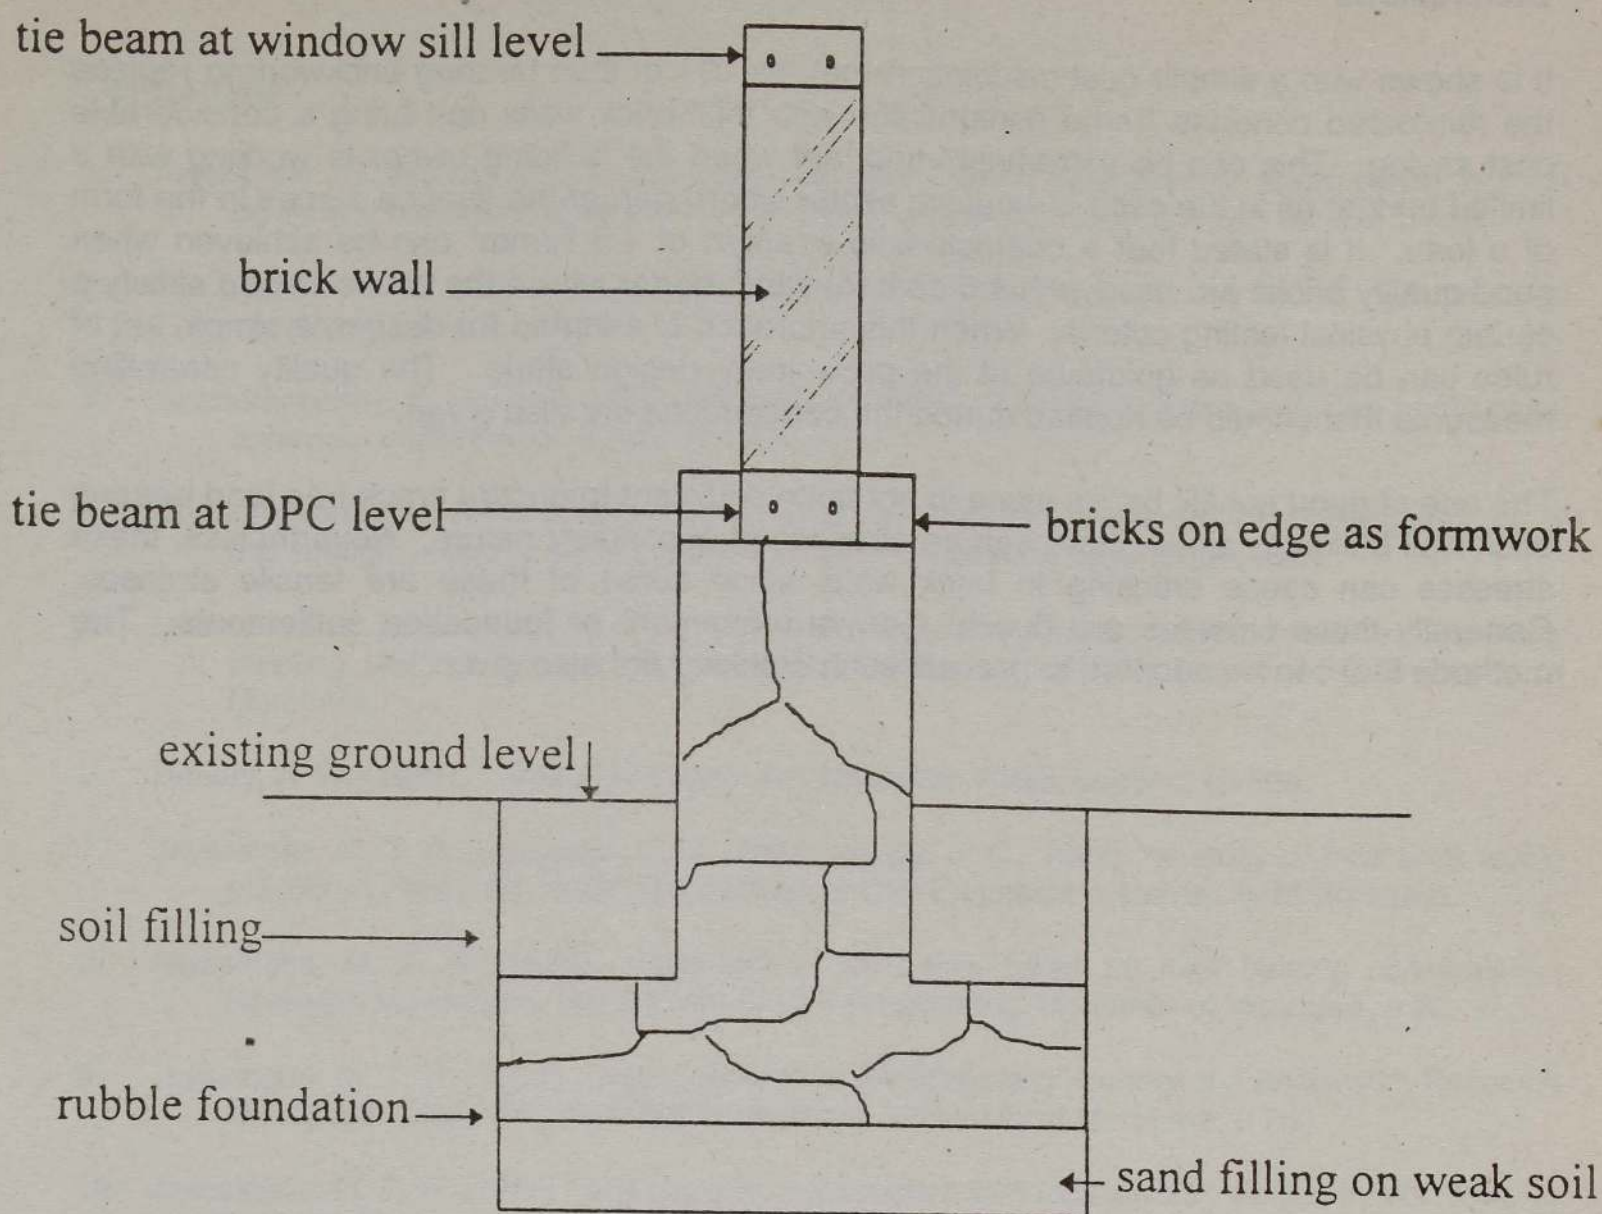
Rubble foundation with tie beams at DPC and window sill levels
